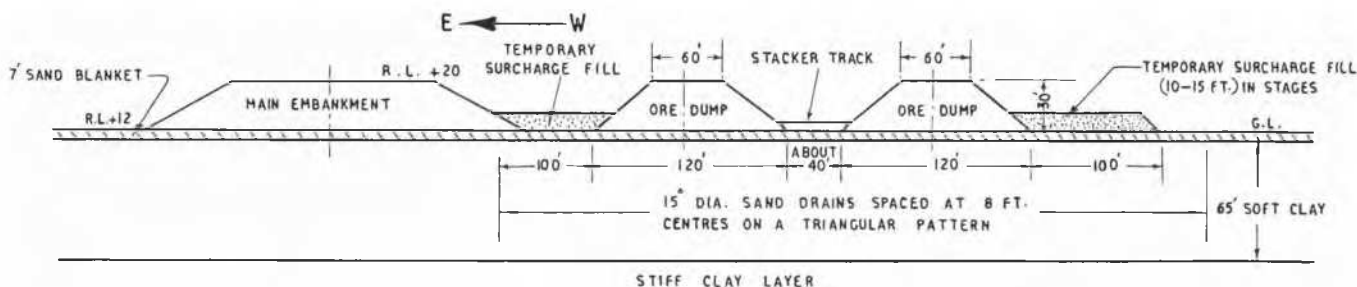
Cross-section of ore dump, railway embankment, and stacker track. (Not to scale.)
